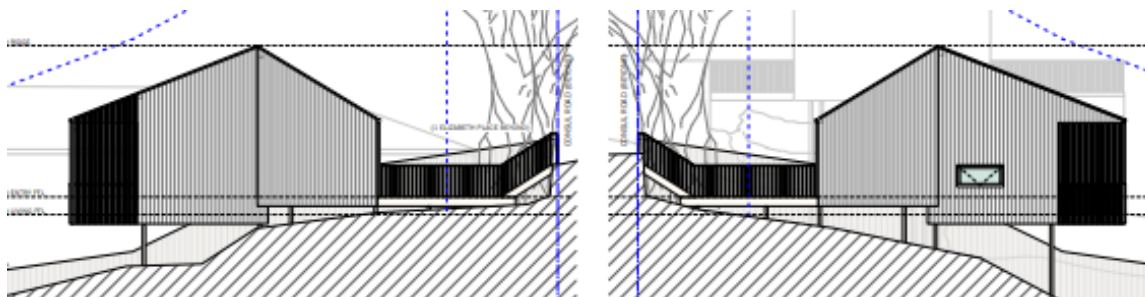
Northern (side) and Western (side) elevation of secondary dwelling (source - Adriano Pupilli Architects)
